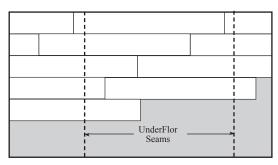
Install UnderFlor with seams perpendicular to the long dimension of the DuraPlank II flooring.
